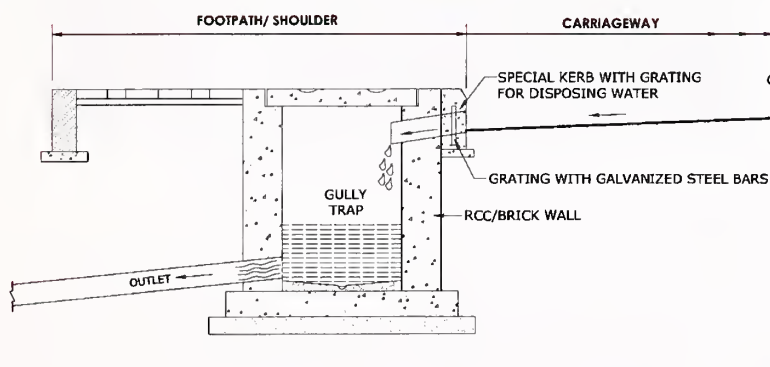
A Sectional View of Gully Trap Provided on a Footpath
